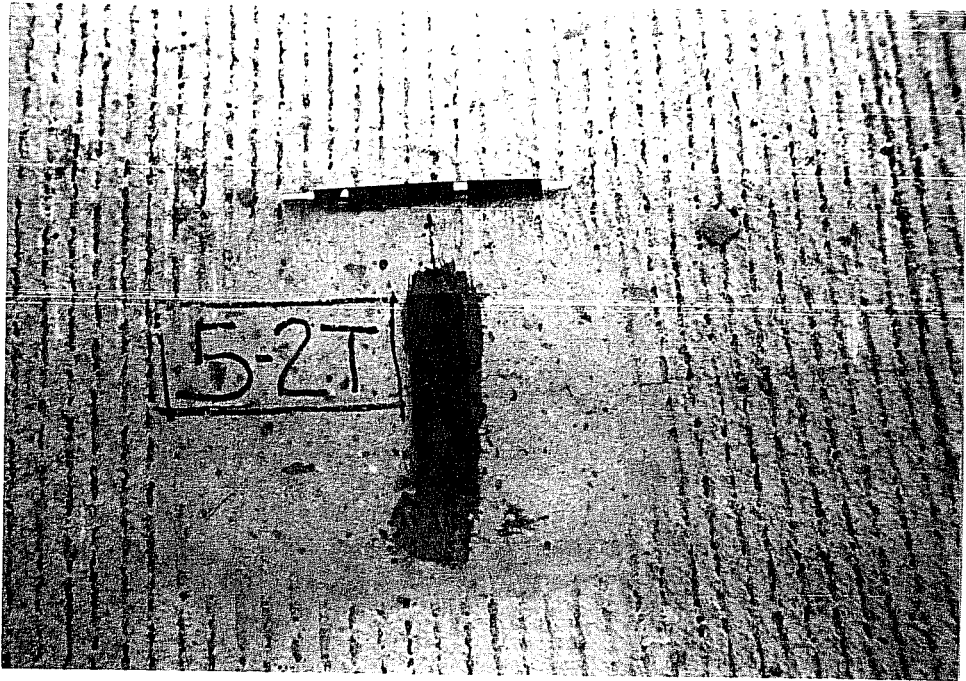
Strain gage installed on ground surface on top of deck slab
